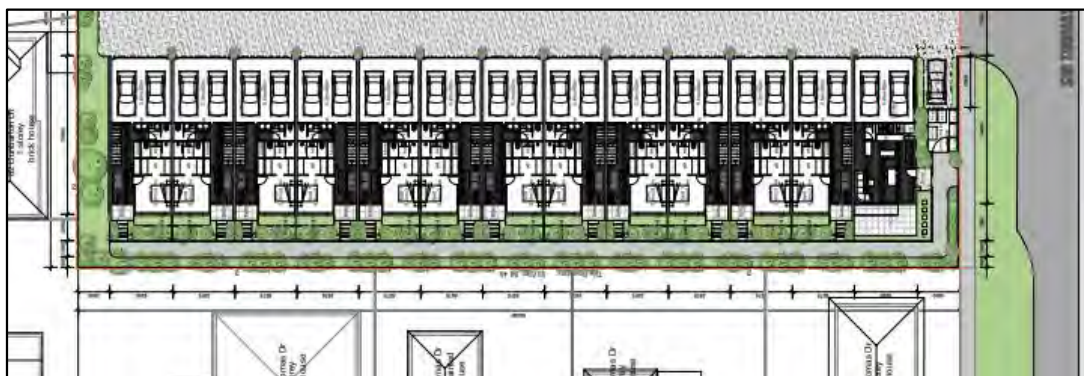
Ground floor of southern flank of townhouses (Townhouses No. 1-13)
